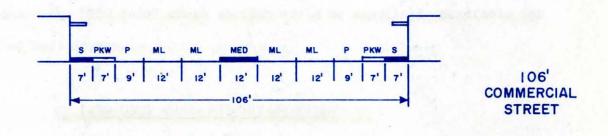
illustrates suggested cross sections to be established in the Major Street Plan. In general, primary arteries should be developed on rights-of-way of not less than 106 feet and secondary and collector streets on rights-of-way of not less than 80 feet and minimum access streets should be not less than 60 feet.
